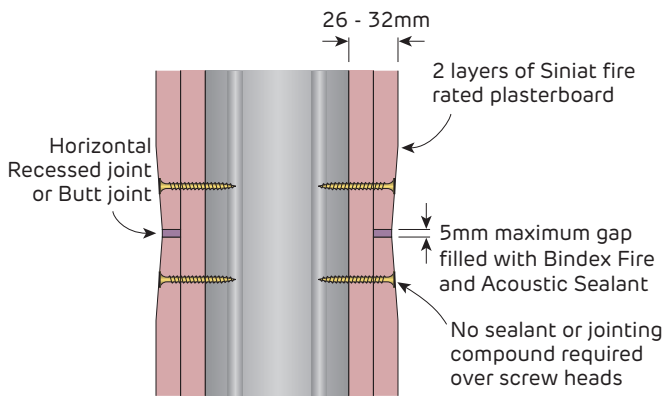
Horizontal Joints in Double Layer Wall Systems
